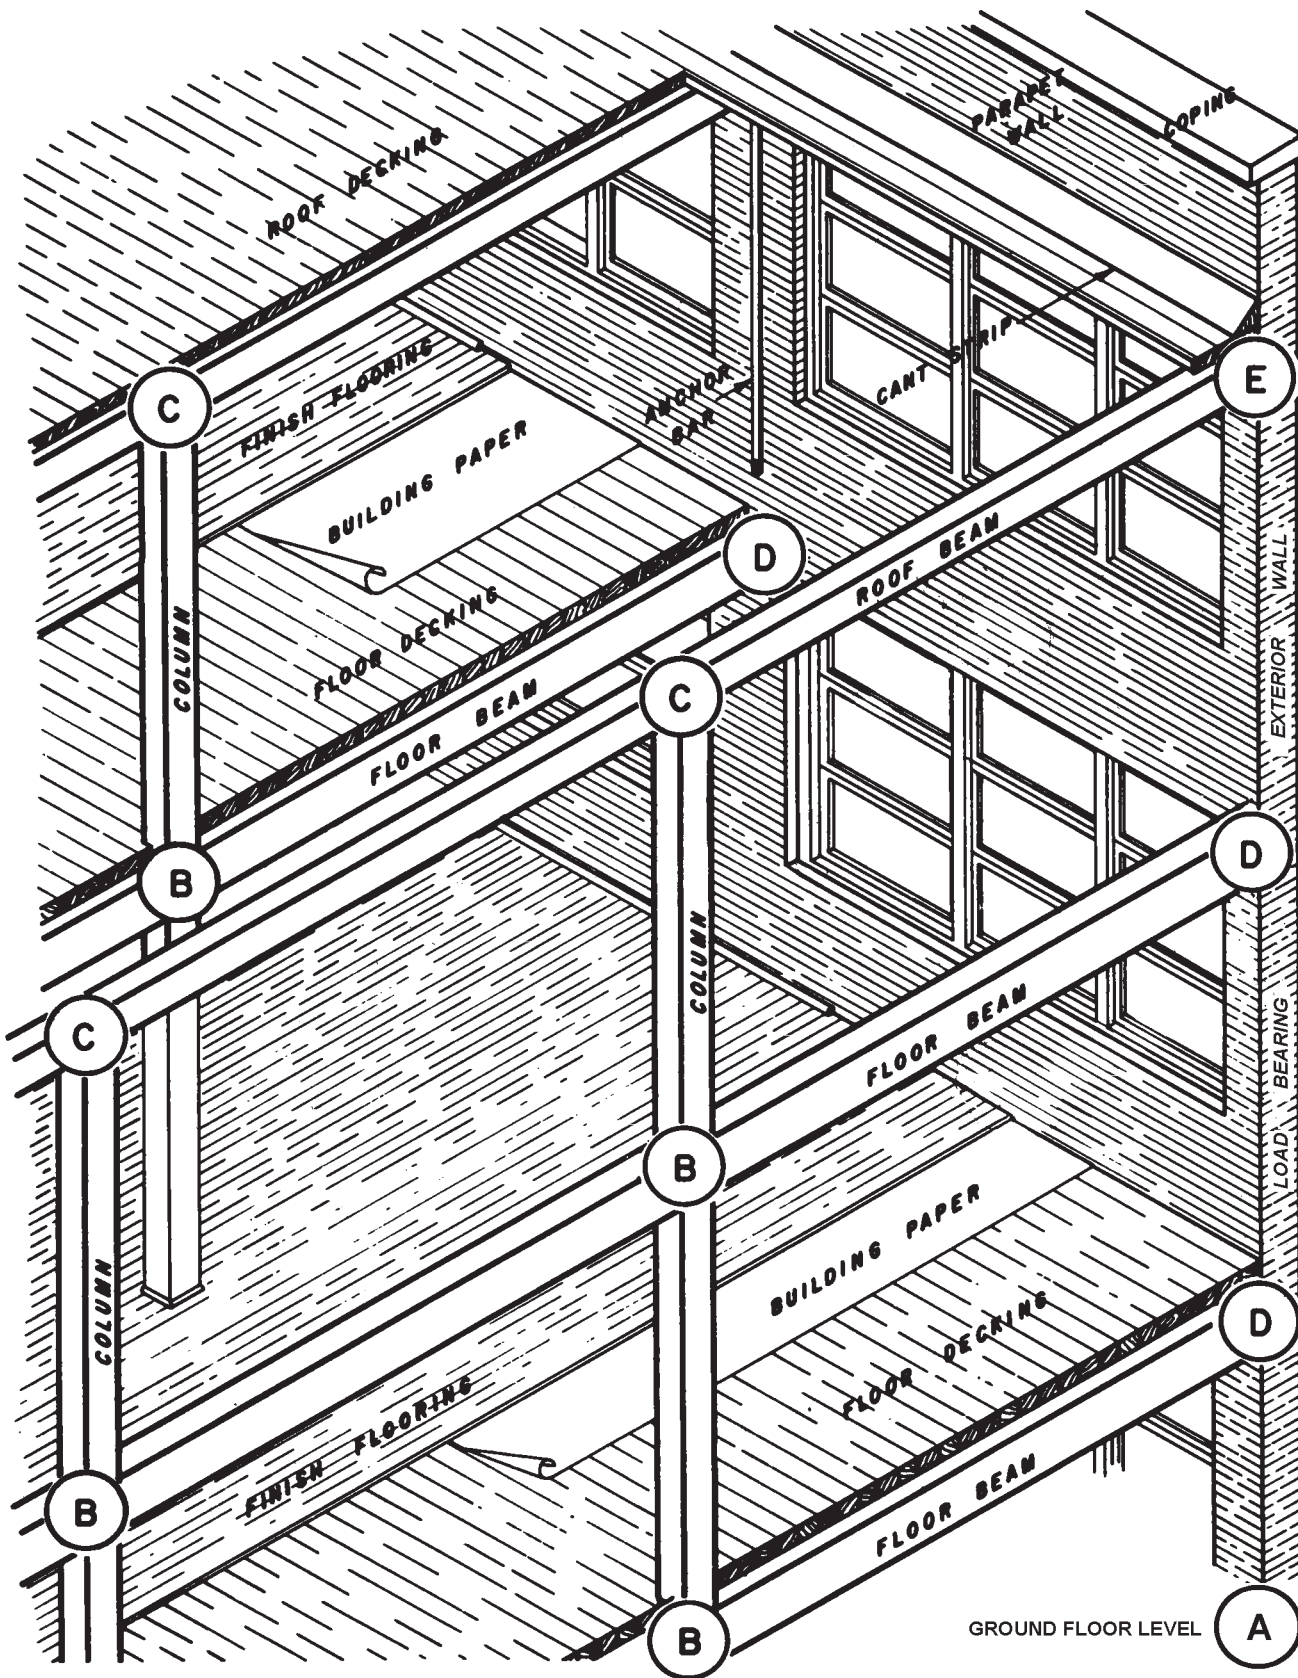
Multi-Story Building with Decking on Beams and Girders (Refer to details in Figures 3-9)
